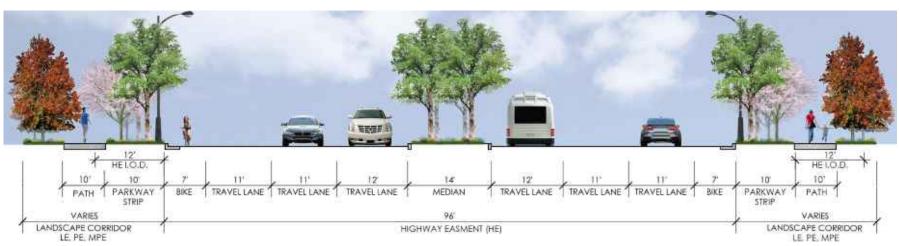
Sunset Boulevard-Section B1, 6-Lane Arterial (Placer Ranch Entry to Foothills Boulevard)
